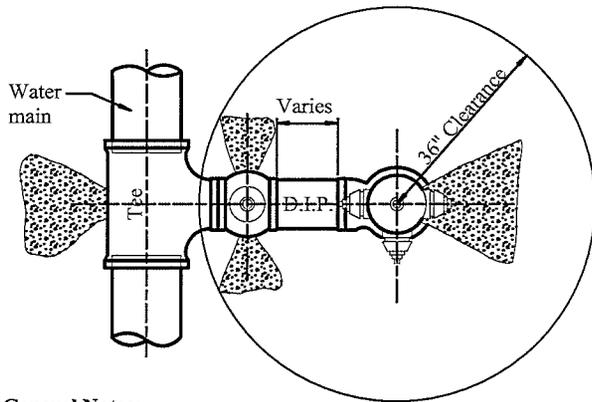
MARICOPA ASSOCIATION of GOVERNMENTS	STANDARD DETAIL ENGLISH	DRY BARREL FIRE HYDRANT INSTALLATION	REVISED 04-27-2011	DETAIL NO. 360-1
